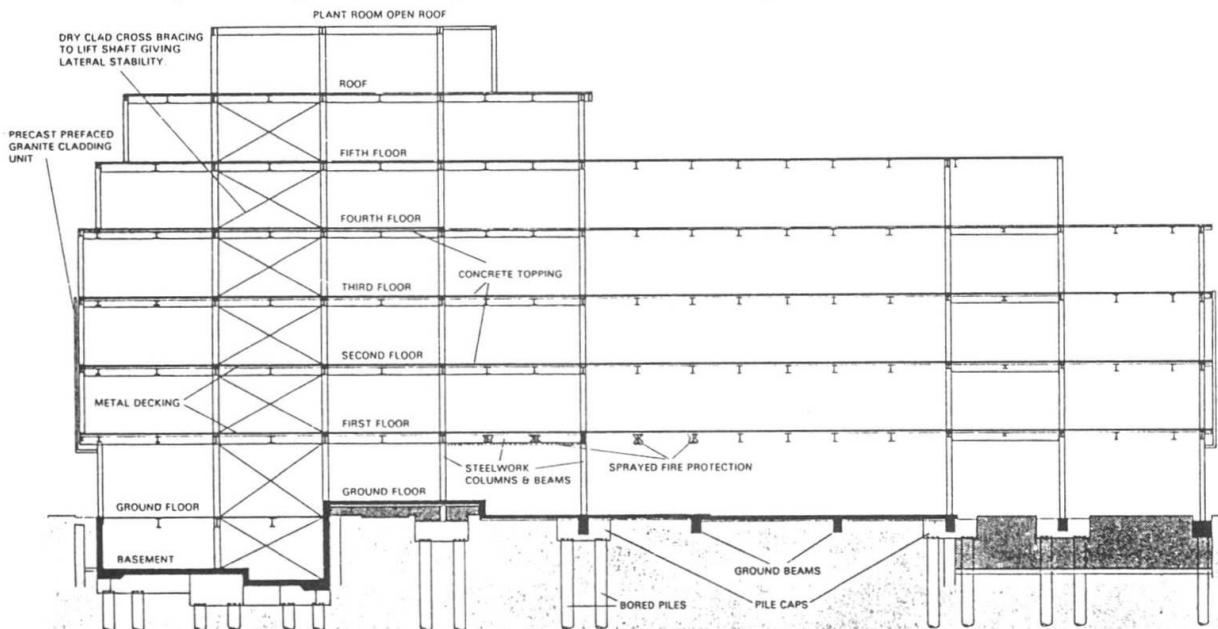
Cross section showing wind bracing. (Cutlers Court, London.)
